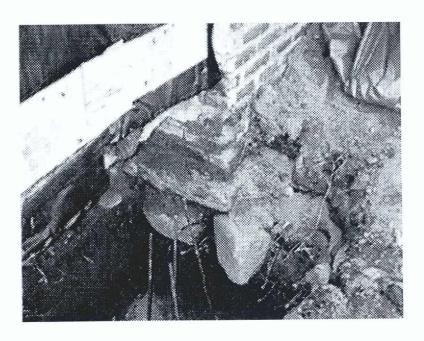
Preserves jar recovered from foundation excavations at the northeast corner of the summer kitchen on 12/2/97.
